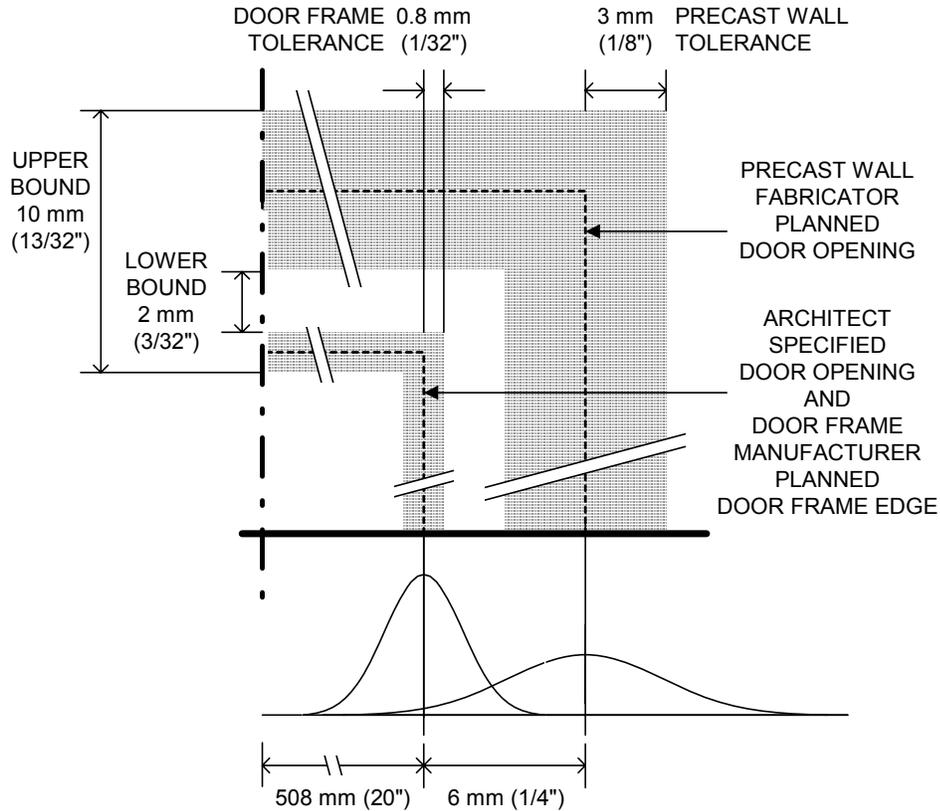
Tolerances on Door Frame and Precast Wall
